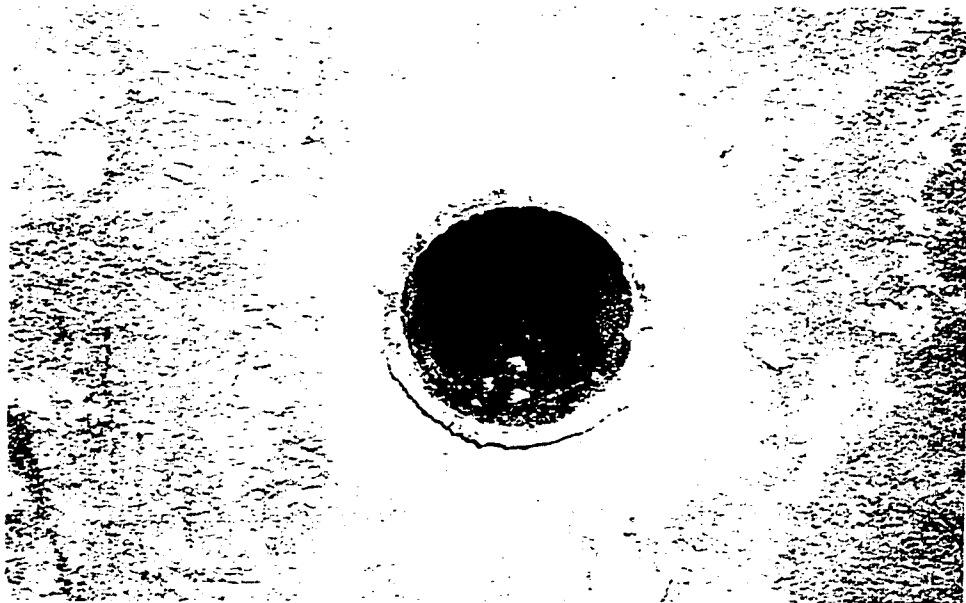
Two Week Excavation of 200mm Pipe in Clay
